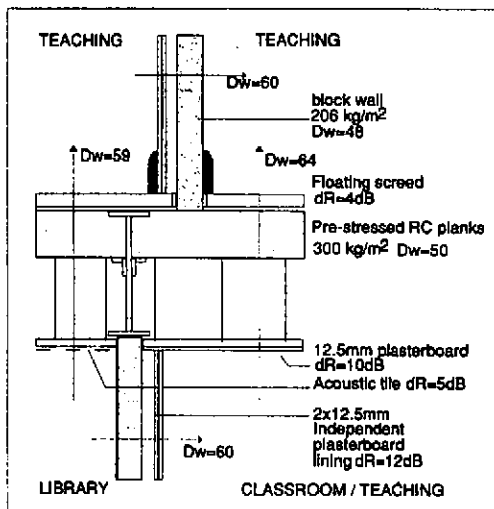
Wall/floor/ceiling junction showing forms of construction and preliminary estimates of sound insulation
